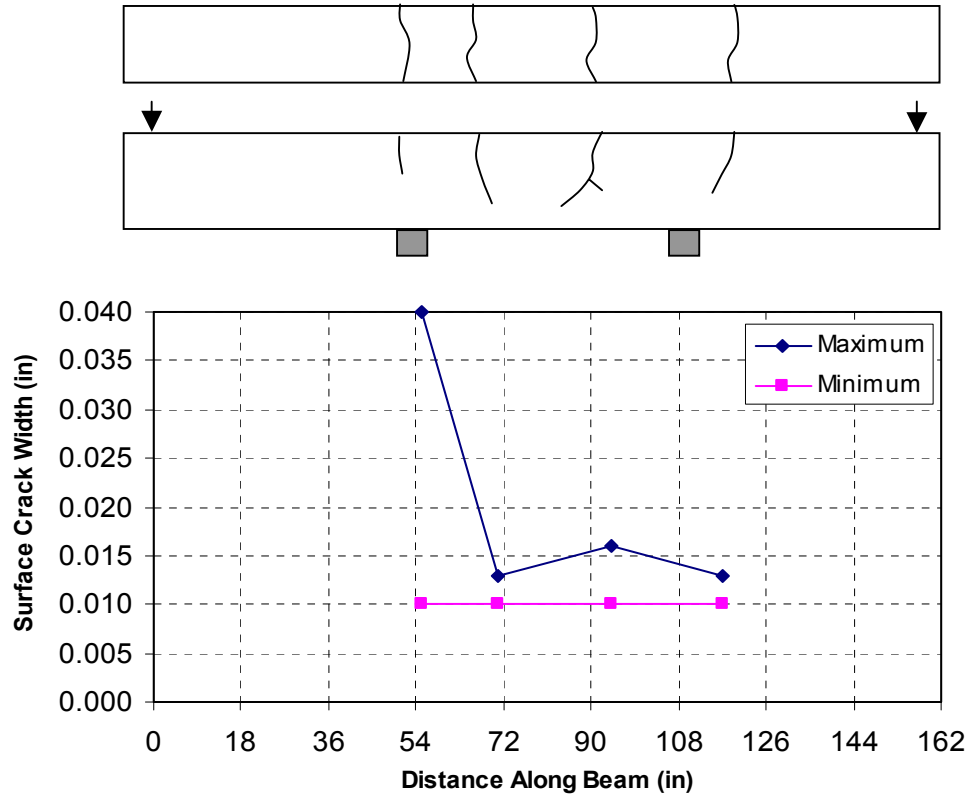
Final Crack Pattern and Measurements – Beam 2.6
